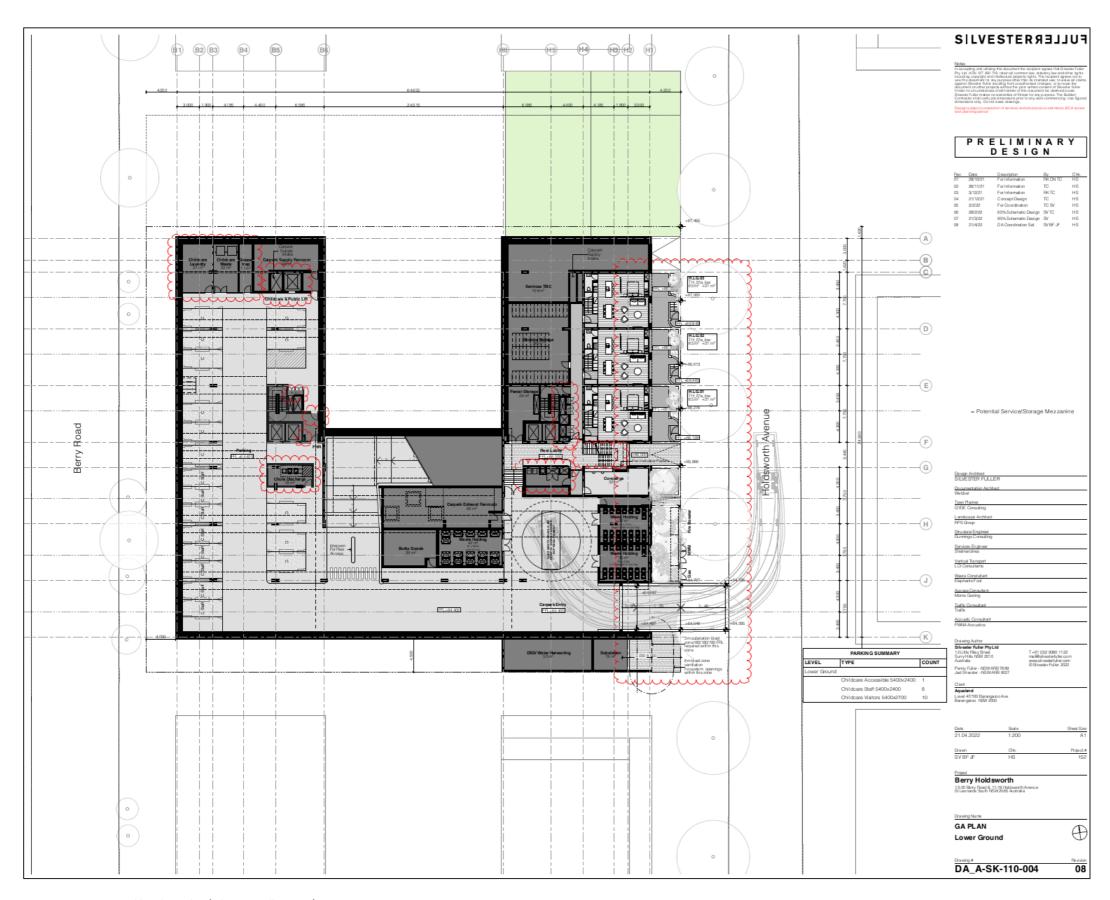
Lower ground level GA Plan (Silvester Fuller 2022)
